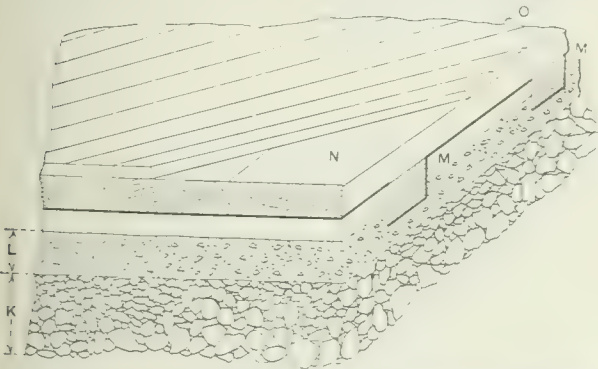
Plank Floor with Air Spaces. Foundation of Broken Stone and Concrete.
